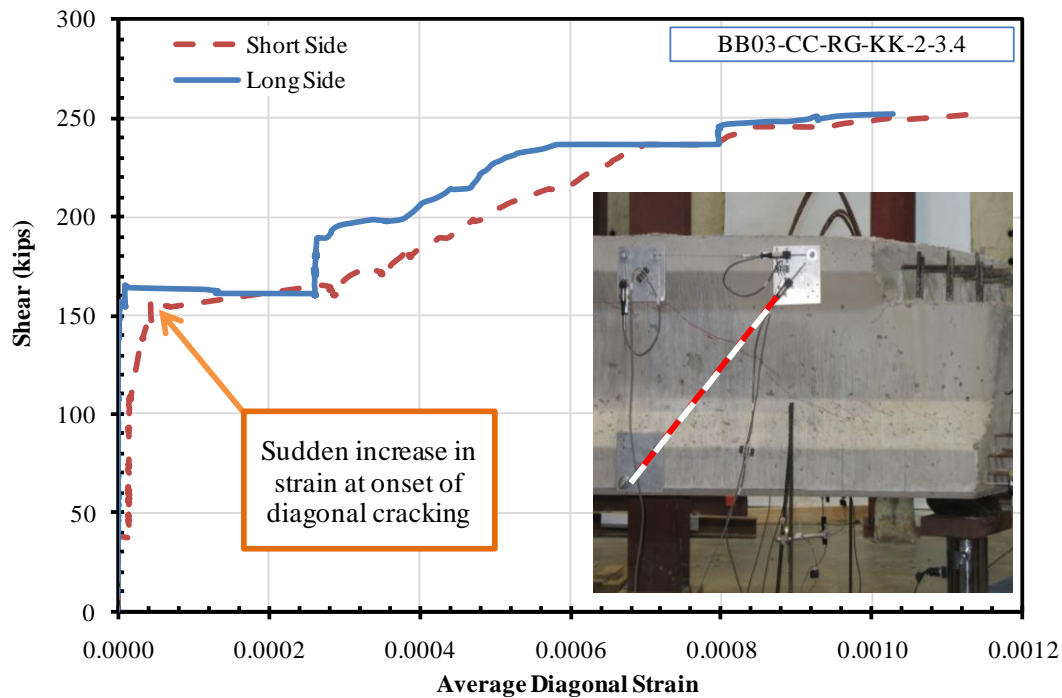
Determination of diagonal shear cracking load with external instrumentation.
